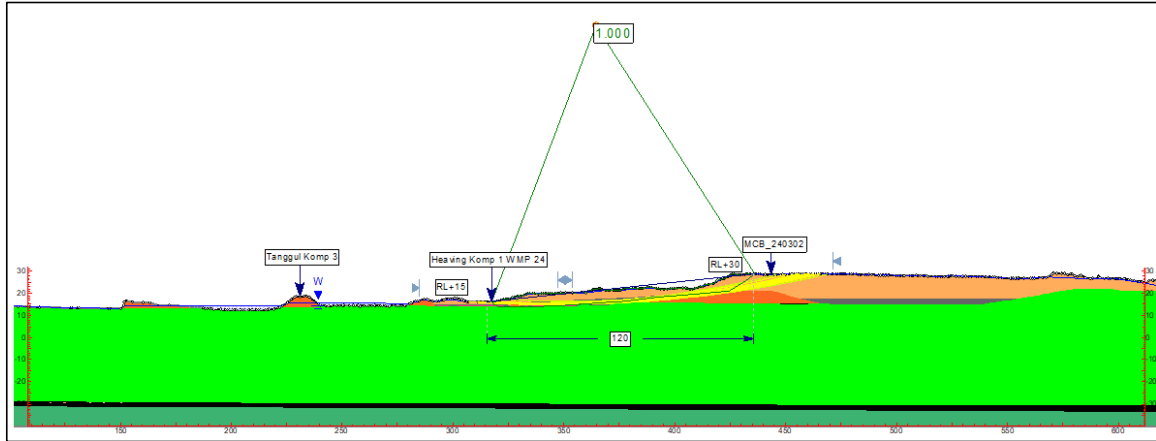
Failure Analysis of West Out Pit Dump Back FK (Section A-A')
